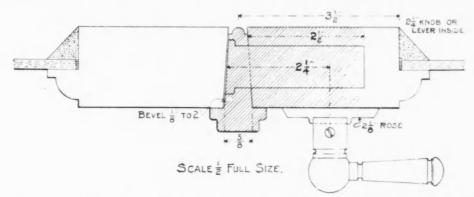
13" Double Door, Open in, on Which the Narrowest Cylinder Front Door Lock Can Be Used
